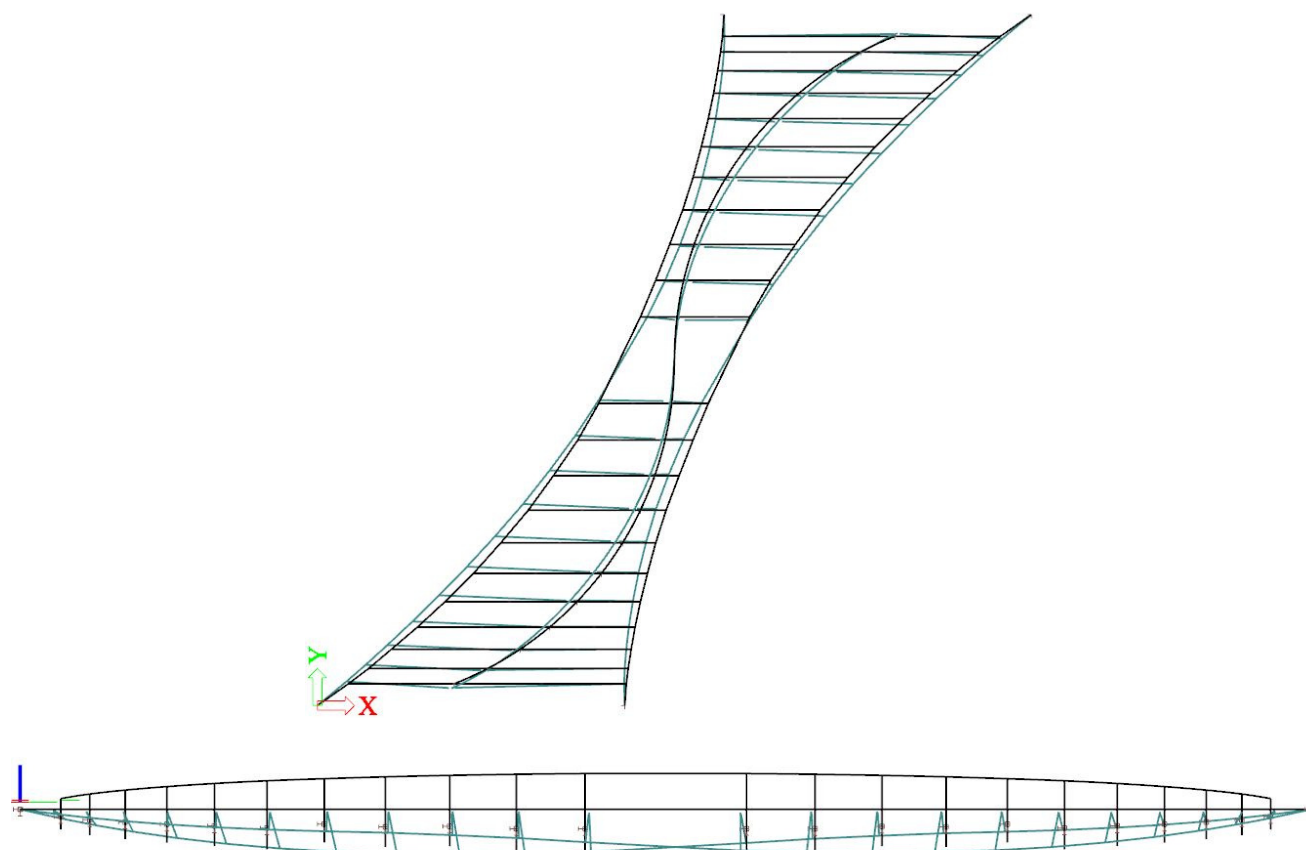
DEFORMED SHAPE OF THE BRIDGE GIRDERS AND ANCHORING SYSTEM IN LC2
